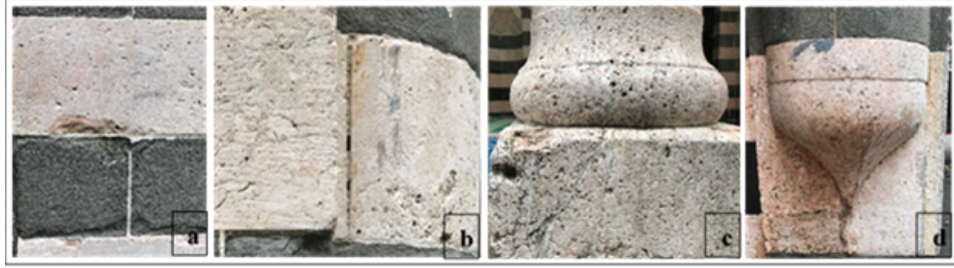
Microkarst Formation a. North Façade Wall b. North Façade Wall c. The column on the North Façade (Left) d. North Façade Wall
